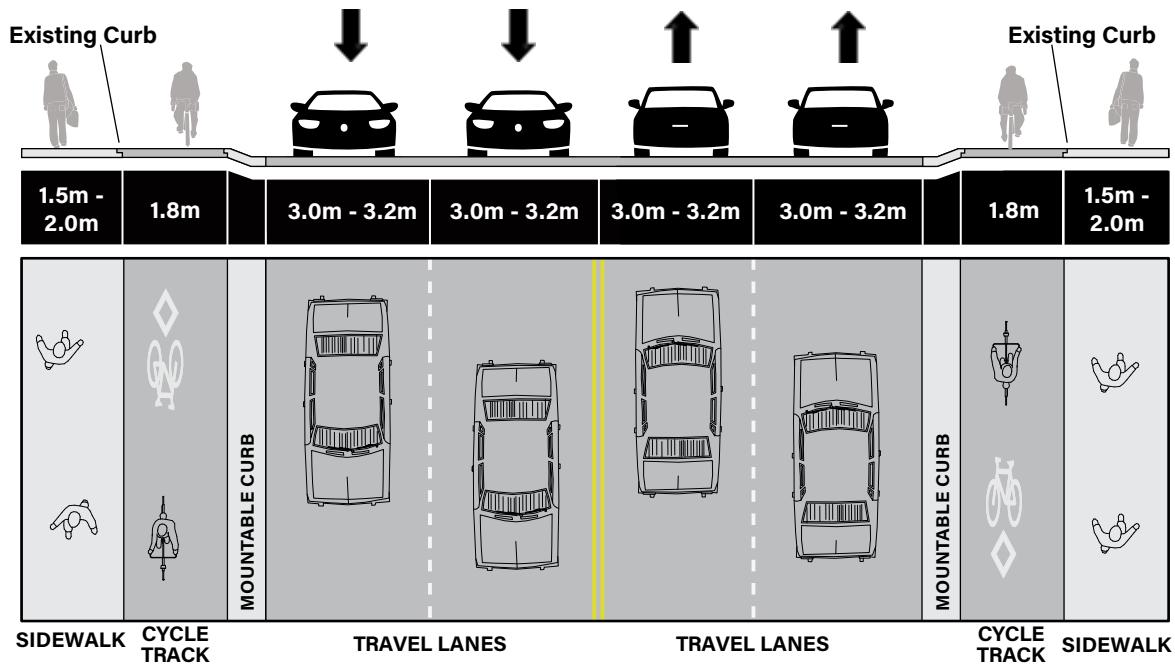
| Typical Short-term/ Existing Shelbourne Street Cross-Section
